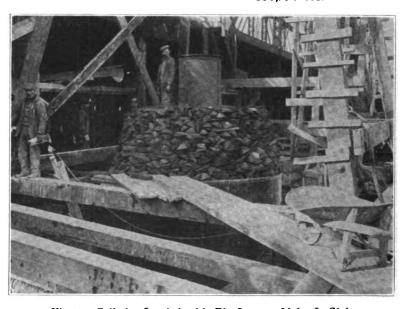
Cylinder Loaded with Pig Iron to Make It Sink.
